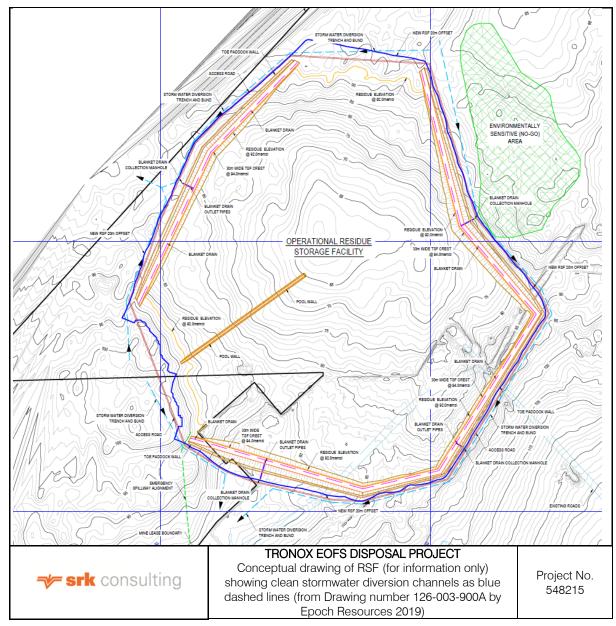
Conceptual drawing of RSF showing stormwater diversions
